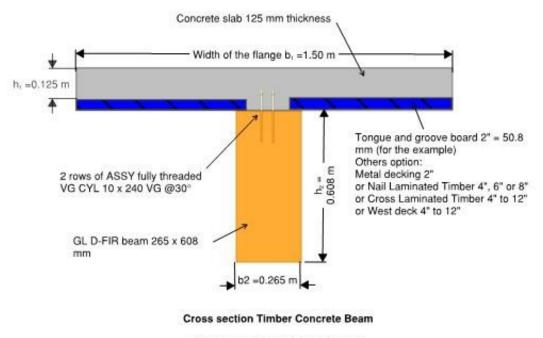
Project example TCC system utilizing STS @ 30° (photo credit Western Archrib—Structural Wood Systems)
